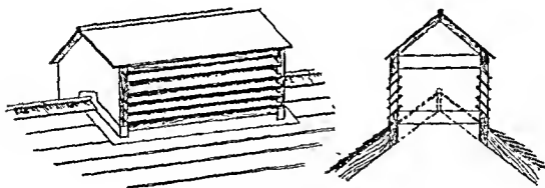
Illustration and section of a Louvre-Board Air Outlet Box fitted to the roof ridge.
